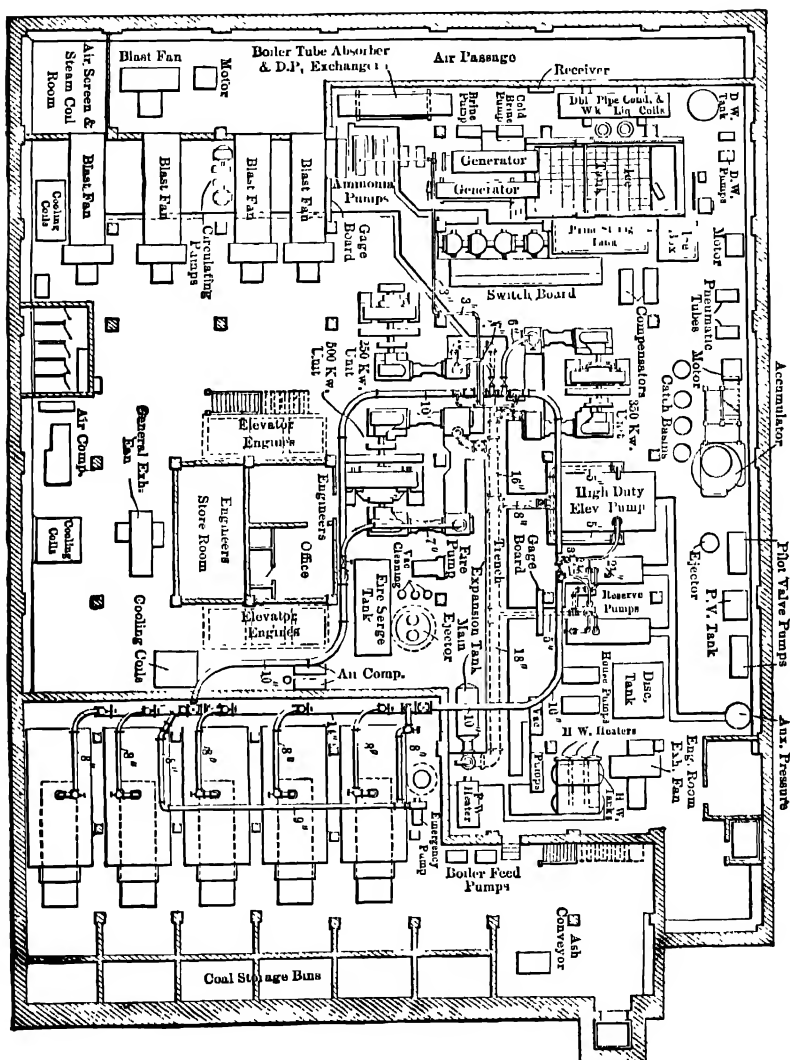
General Arrangement of Steam and Exhaust Piping. La Salle Hotel, Chicago.
